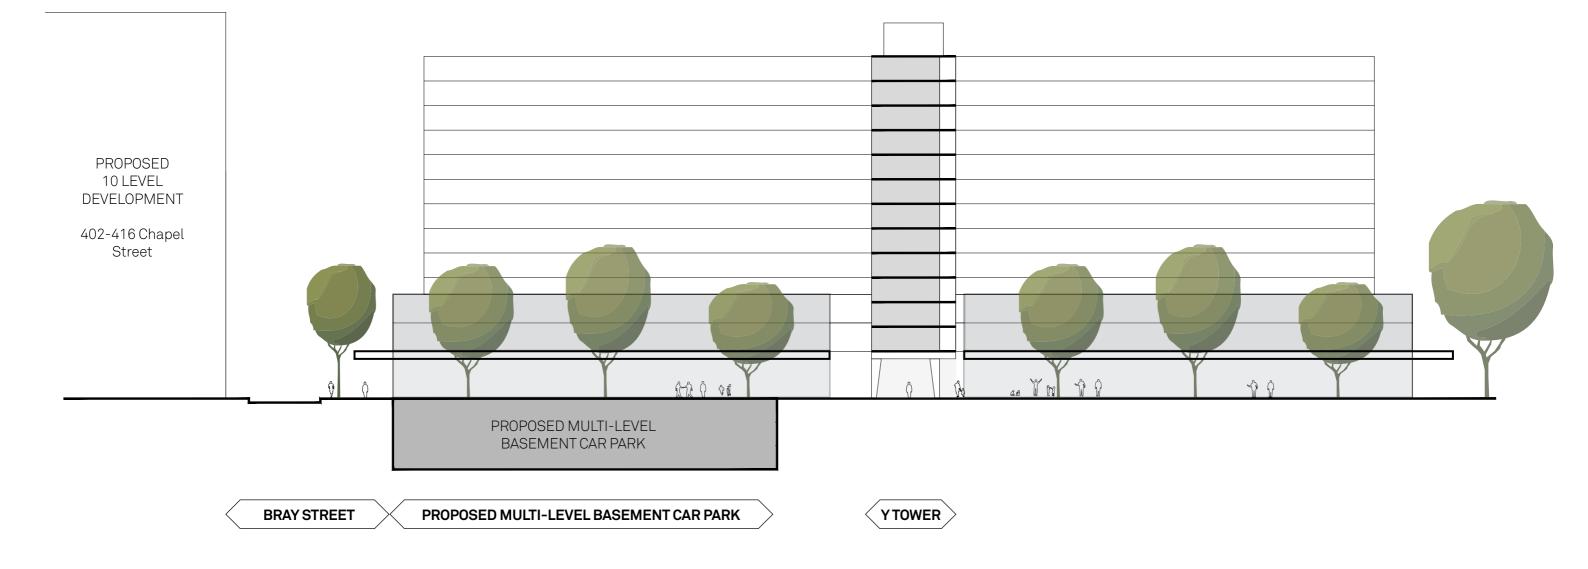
Building Setbacks - Horace Petty North West A Quadrant
